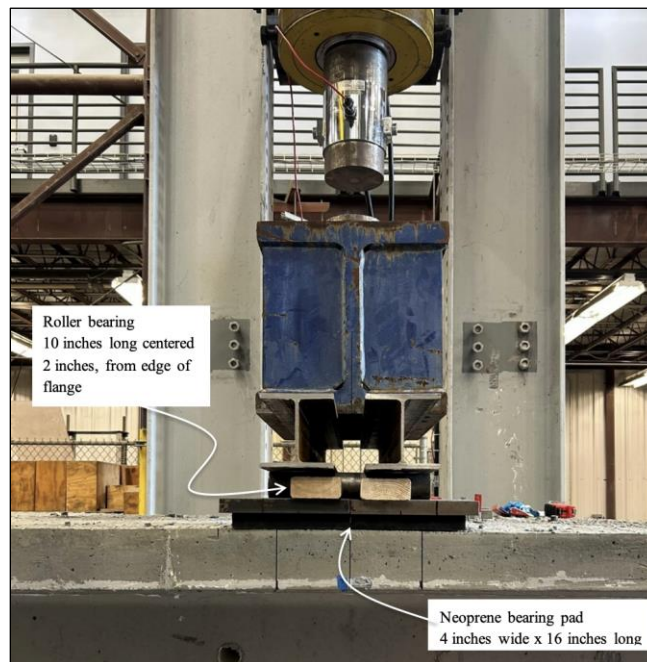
Photo. Test 1.2.F (repair 1.2LTF) top flange test configuration.
